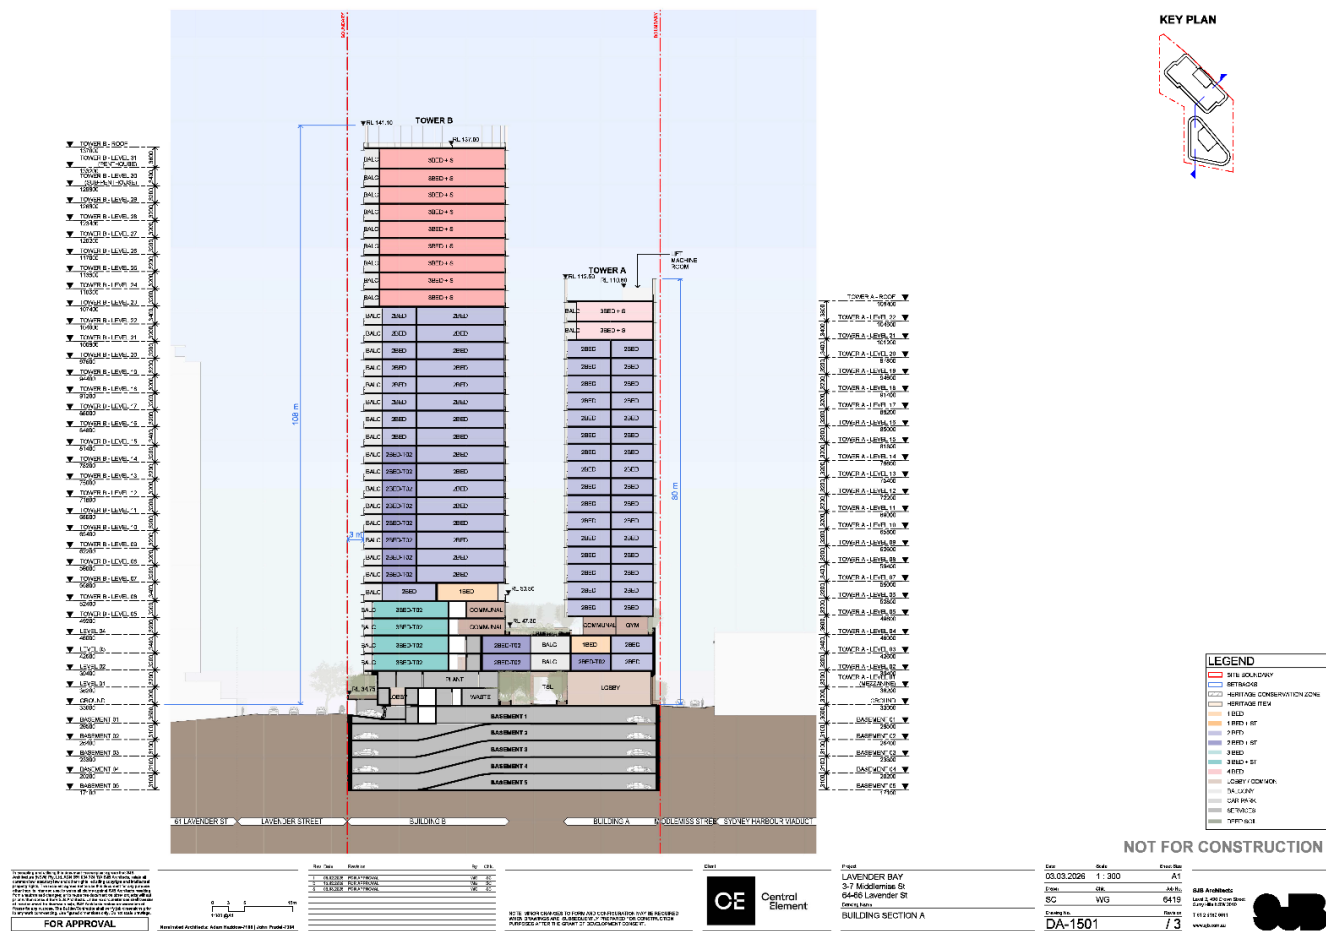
Building Section A, SJB Architects, 3 March 2026, DA-1401.
